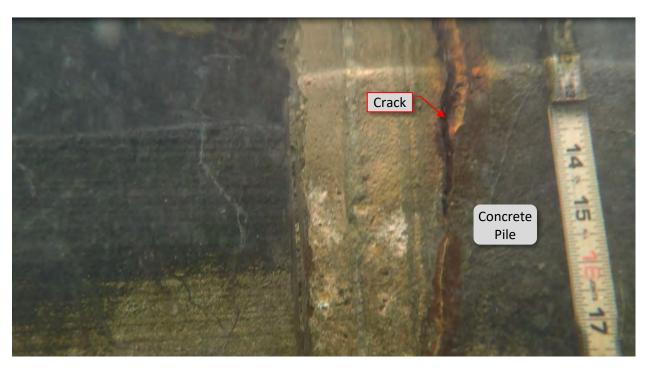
P29. STA 4+92. Cracked and spalled west flange and rust staining at pile
